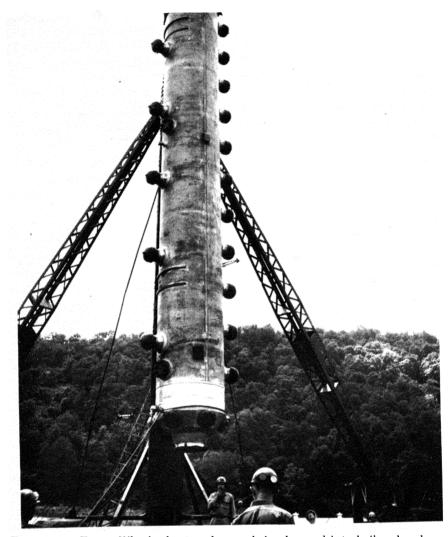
Foster Wheeler heat exchanger being lowered into boiler chamber.
